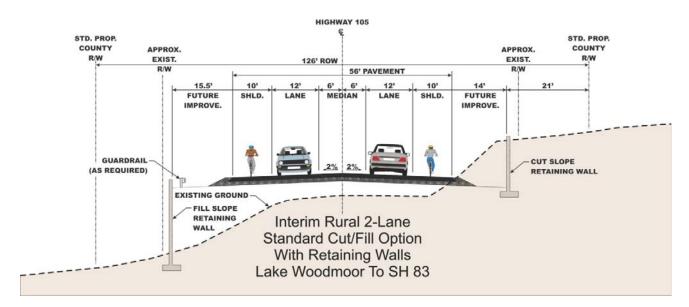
Rural 2-Lane Section – Standard Cut/Fill Option with Retaining Walls
